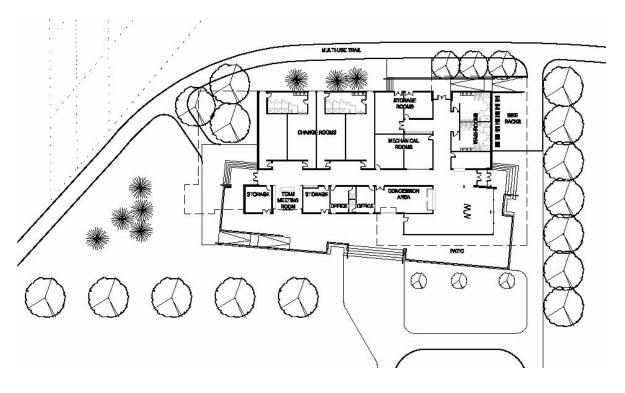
Central Amenity BuildingConceptual Floor Plan
